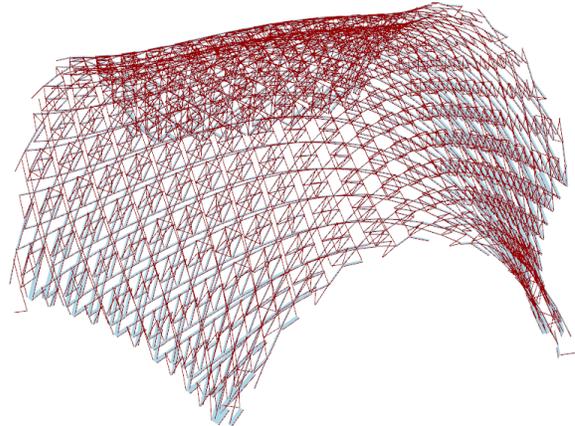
Compressive normal forces in final structure with contact elements under tension removed. The stability of the remaining structure proves the viability of assembling structures from element with compression-only connections., credit: RegoLight consortium, visualisation: Bollinger Grohmann, 2018
